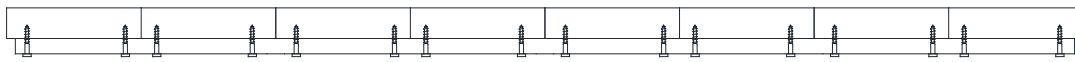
Cross-Section of Glulam Timber Slab Bridges
